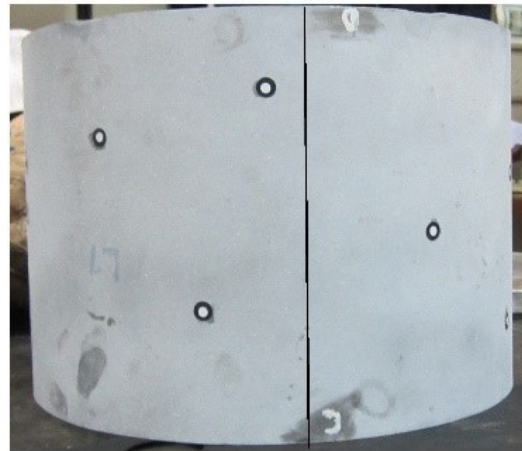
Longitudinal weld in Specimens SL1 and SL2
